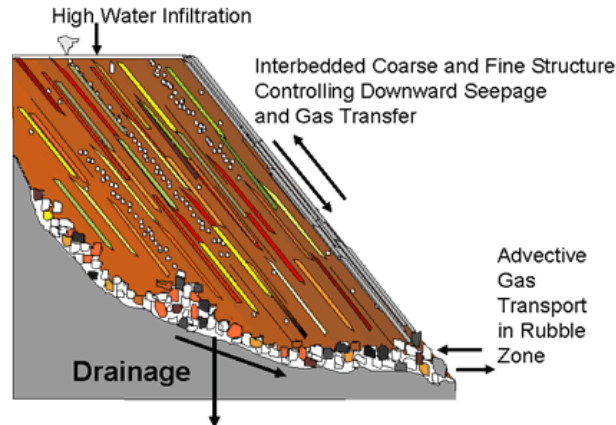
Conventional waste rock dump construction (GARD Guide, 2009)
